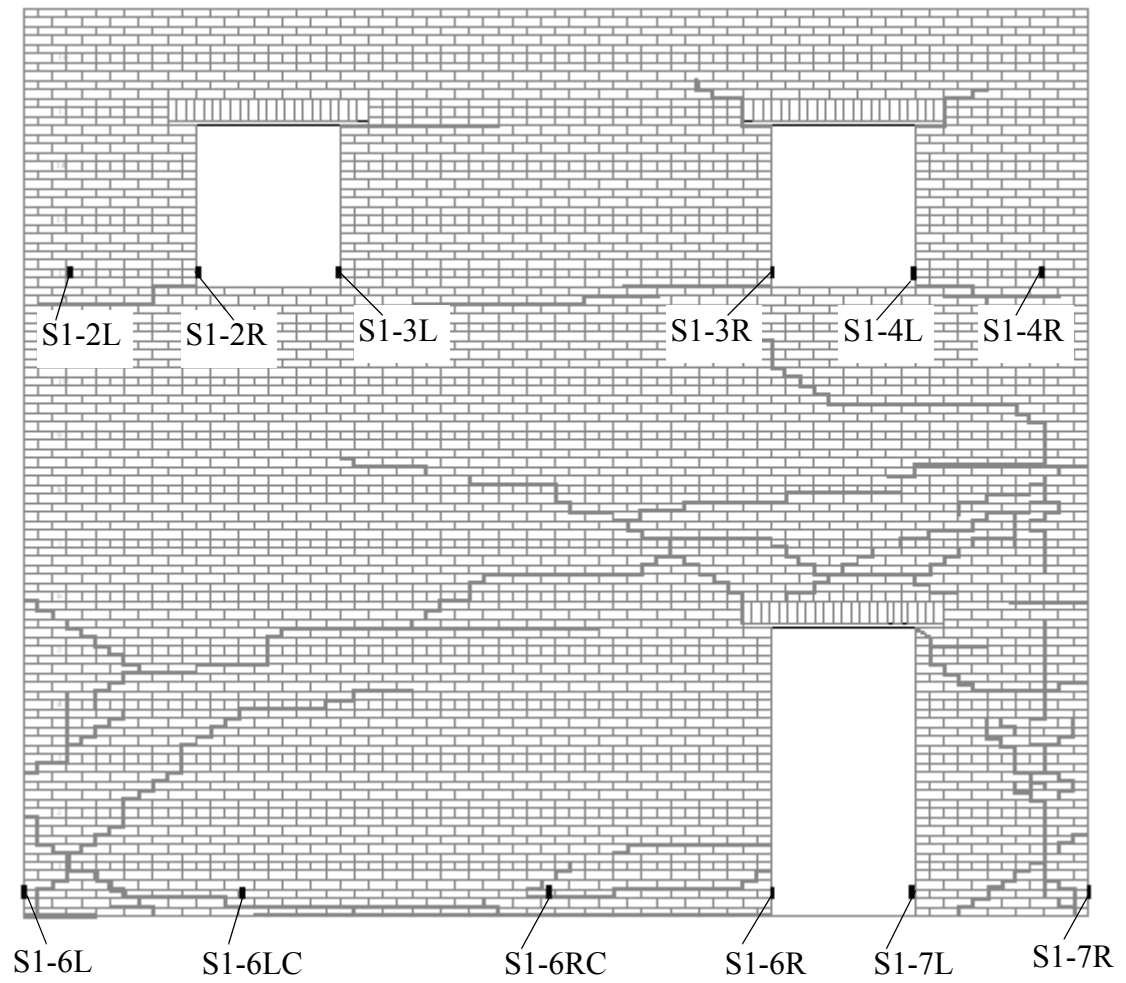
Elevation of Wall 1 illustrating the location of strain gages.
